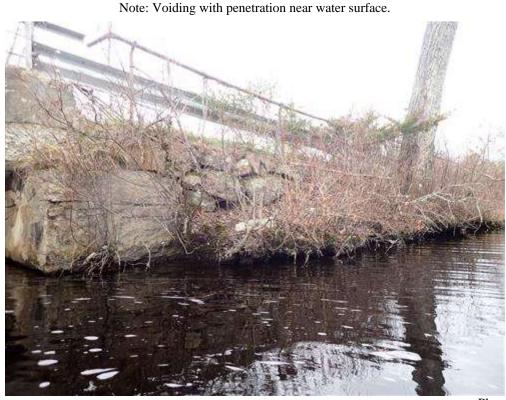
Photo Taken: 04/14/2021 Wingwall 1A and Northwest Embankment
